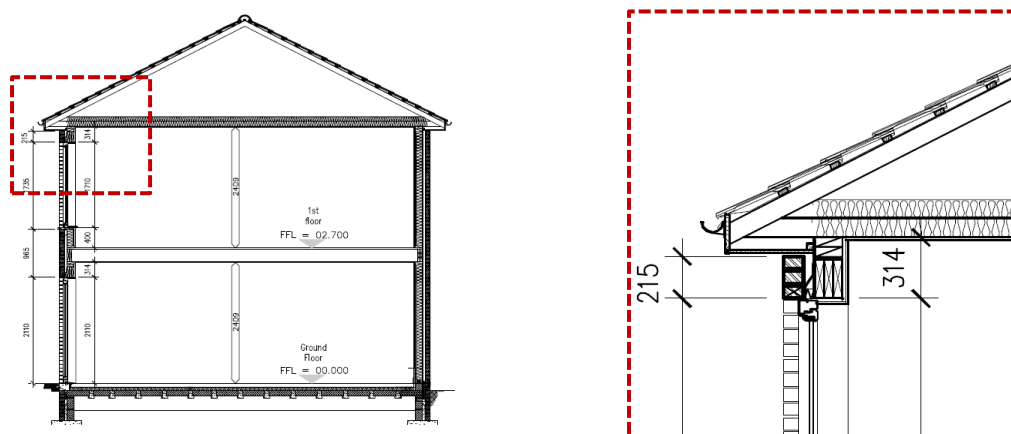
Section and wall-ceiling detail. Poorly fitted insulation at the corner of the roof possibly resulted in the cold spot identified in Figure 15. More robust detailing is recommended for future developments.
